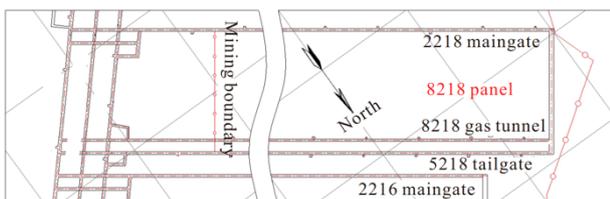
No.8218 panel layout plan of Tashan Coal Mine.
